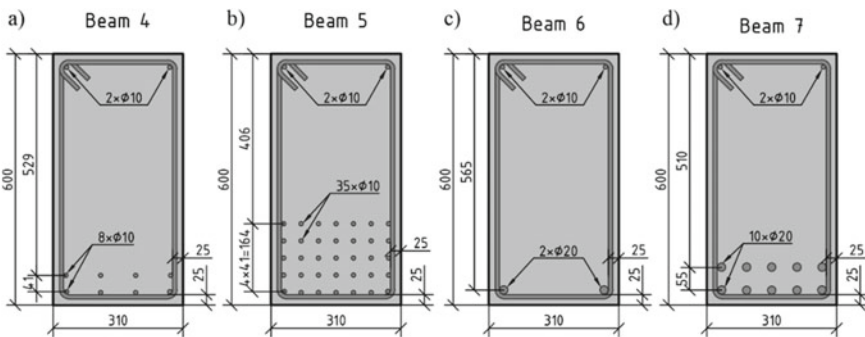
Experimental test RC beams of 600 × 310 mm cross-section
